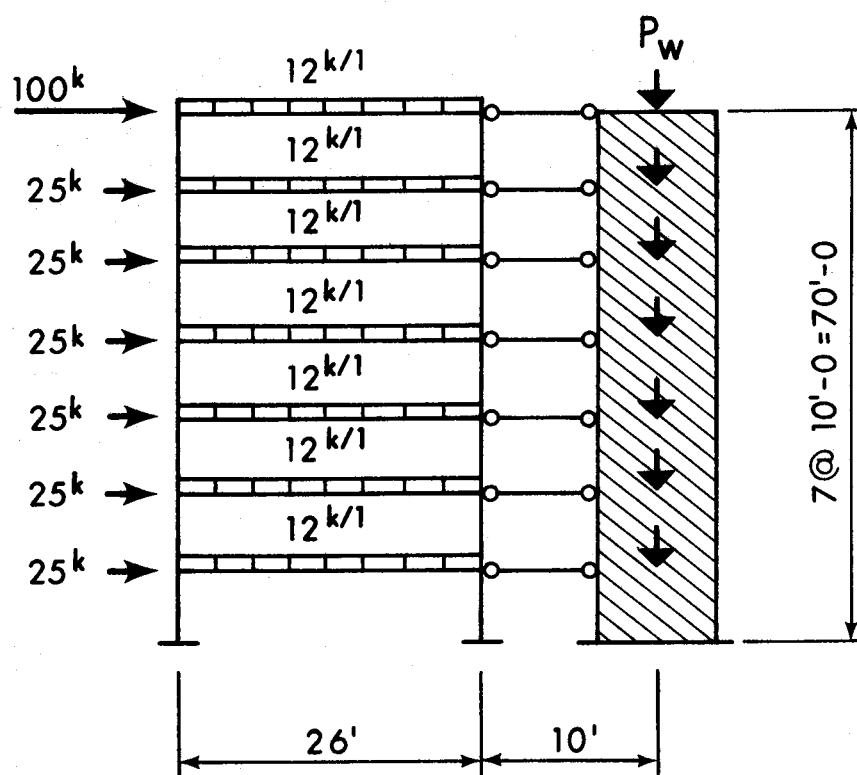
PLANE FRAME-WALL SYSTEM
